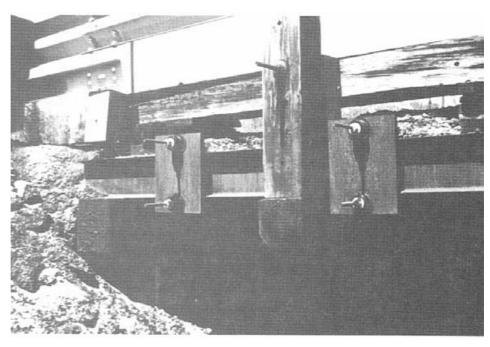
Prestressing rod configuration of the type used on the Hebert Creek Bridge. Rods were placed above and below the existing deck and were anchored to steel plates along the deck edges.
